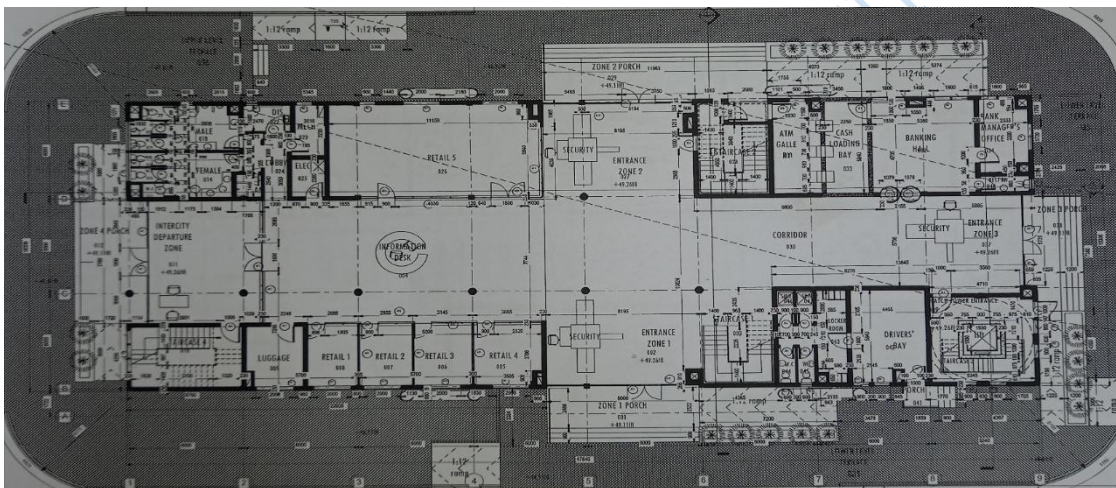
Ground Floor plan of the Modern Bus Terminal at Ojoo in Ibadan.
